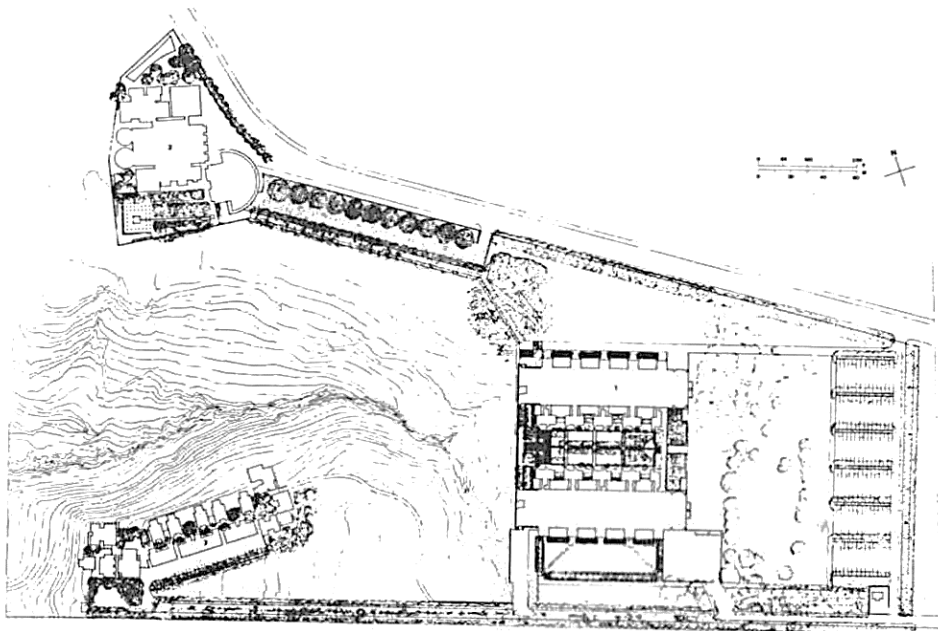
Louis I. Kahn. Proposed site plan. Salk Institute for Biological Studies, La Jolla, CA, 1959-65.
